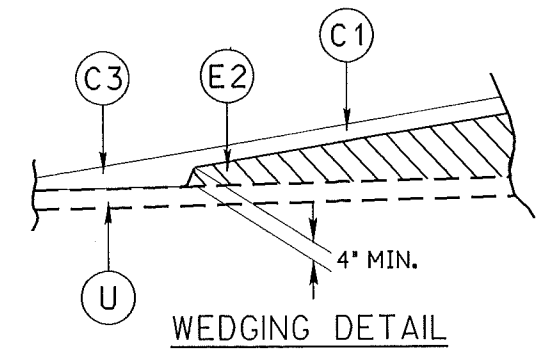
DETAIL SHOWING ASPHALT WEARING SURFACE ON CORED SLAB BRIDGE
